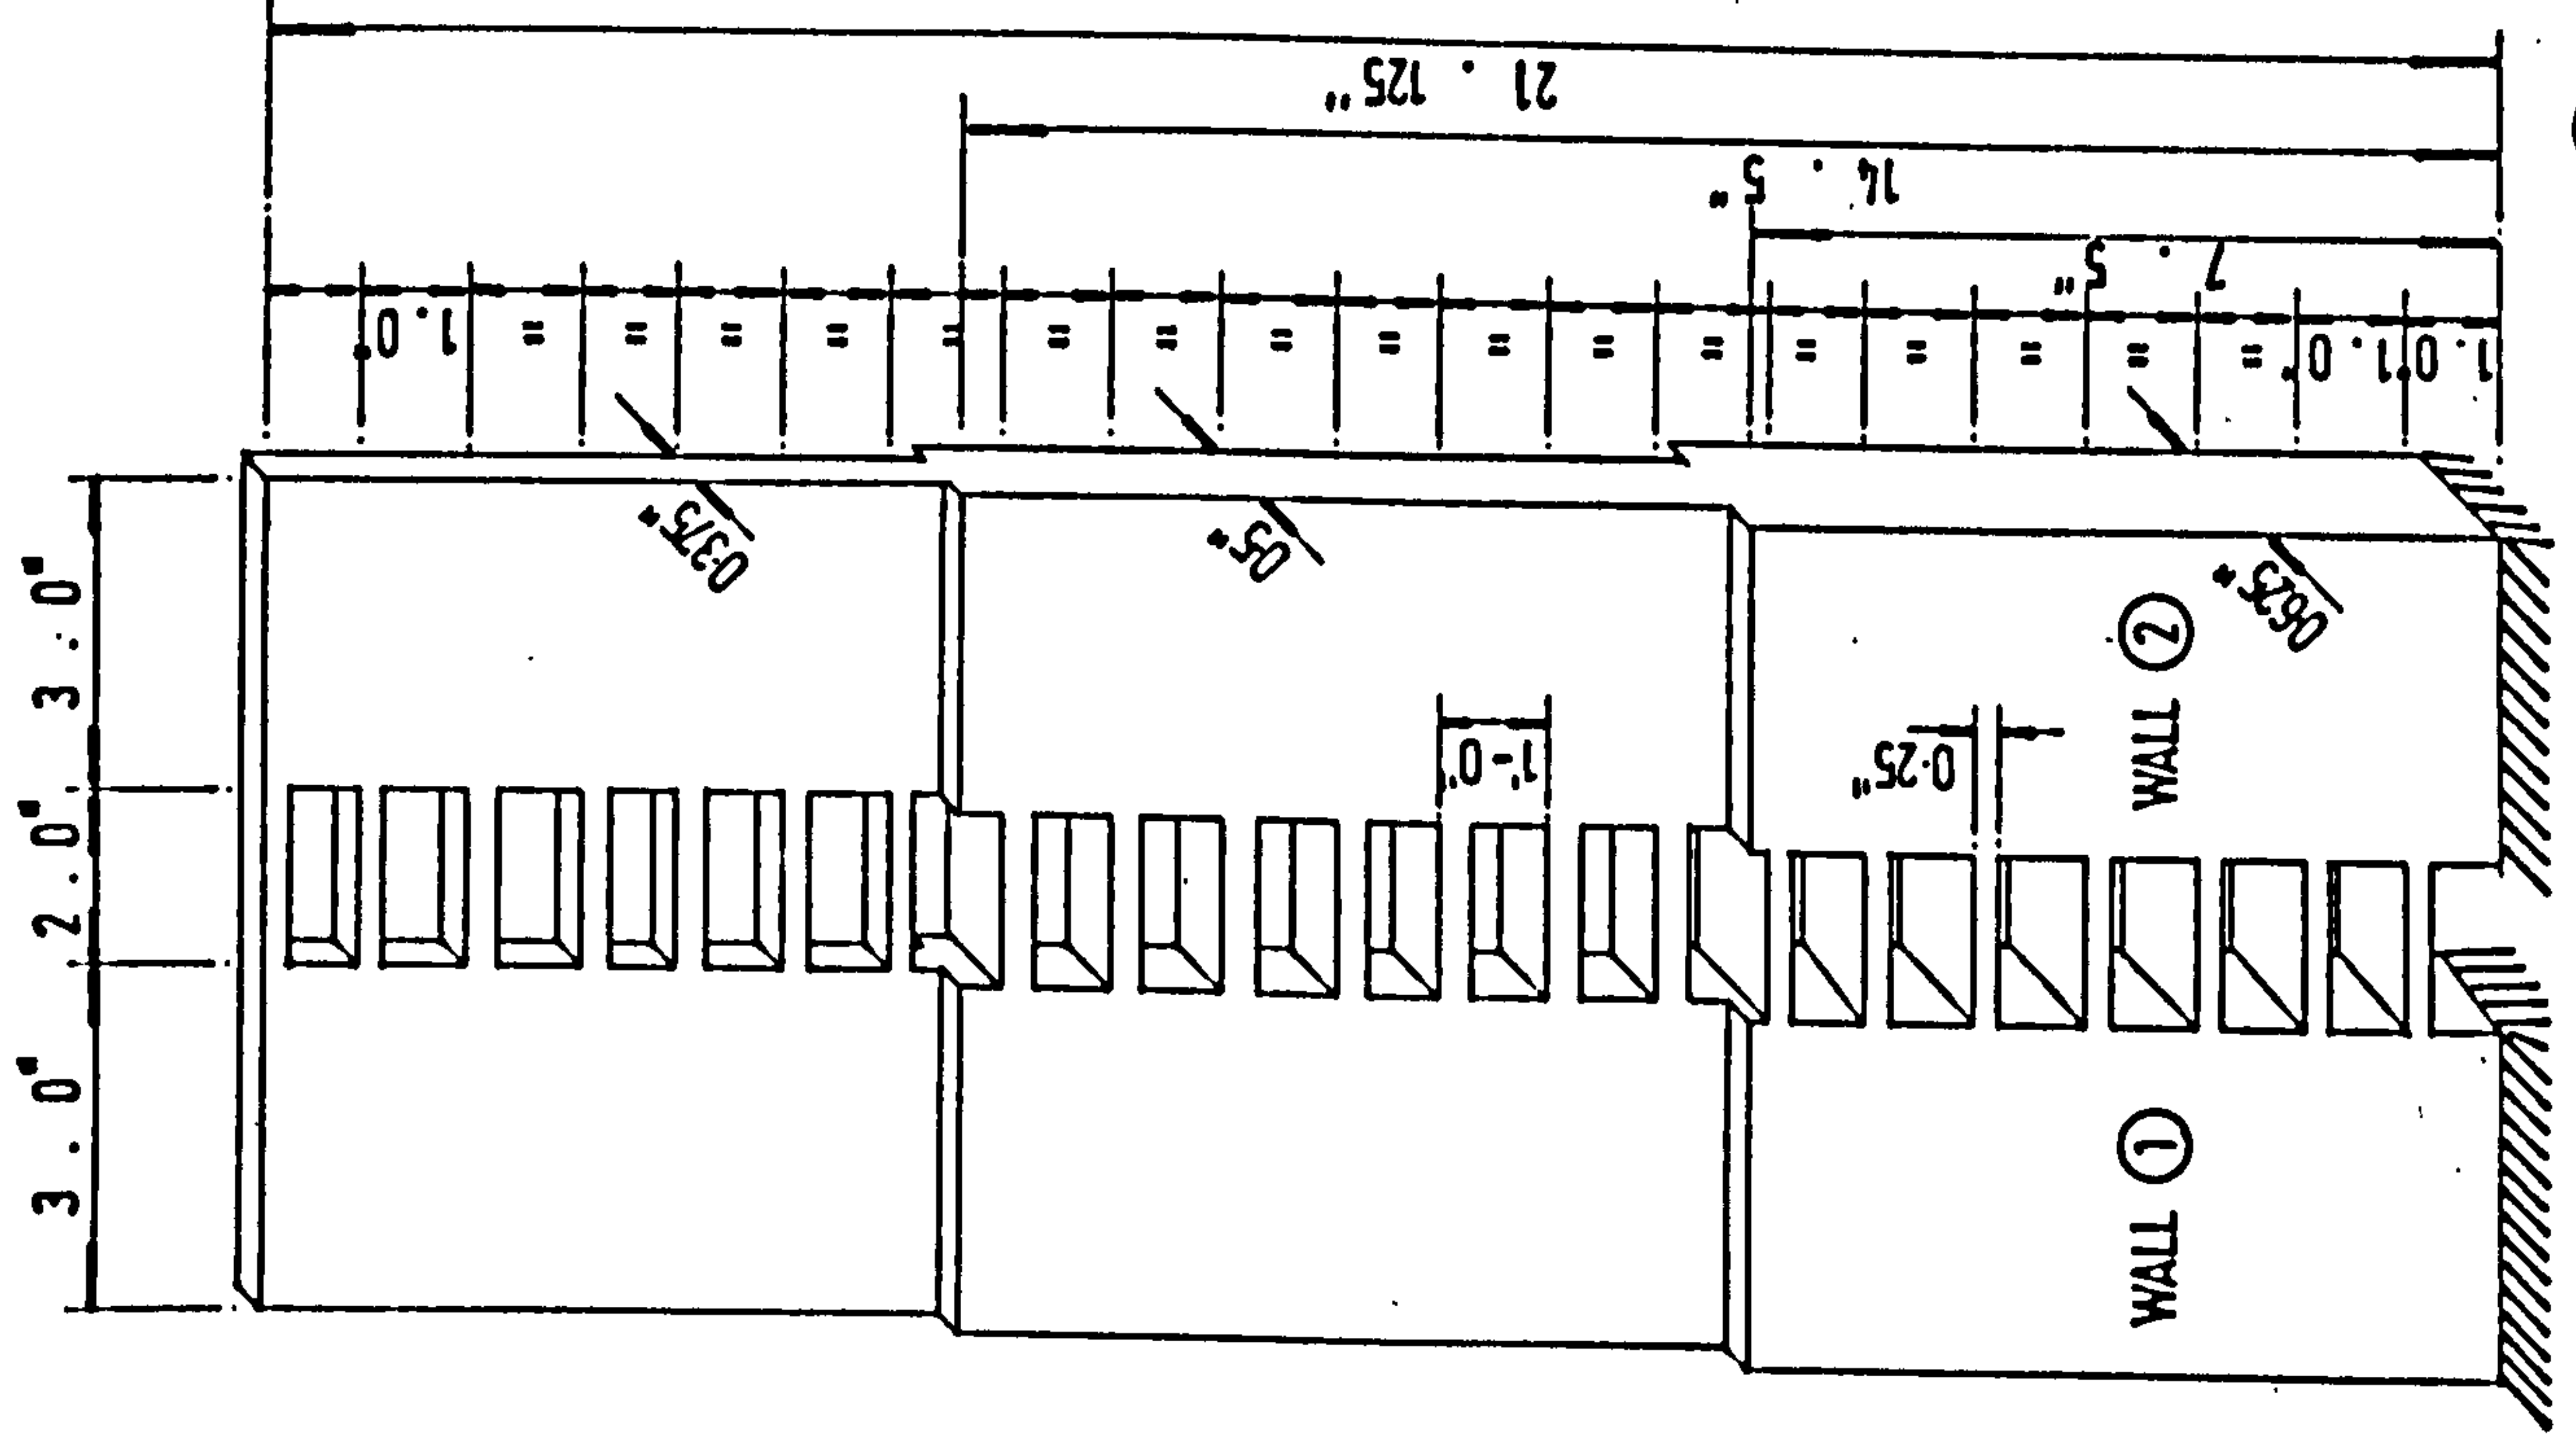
COUPLED SHEAR WALL MODEL (6)
